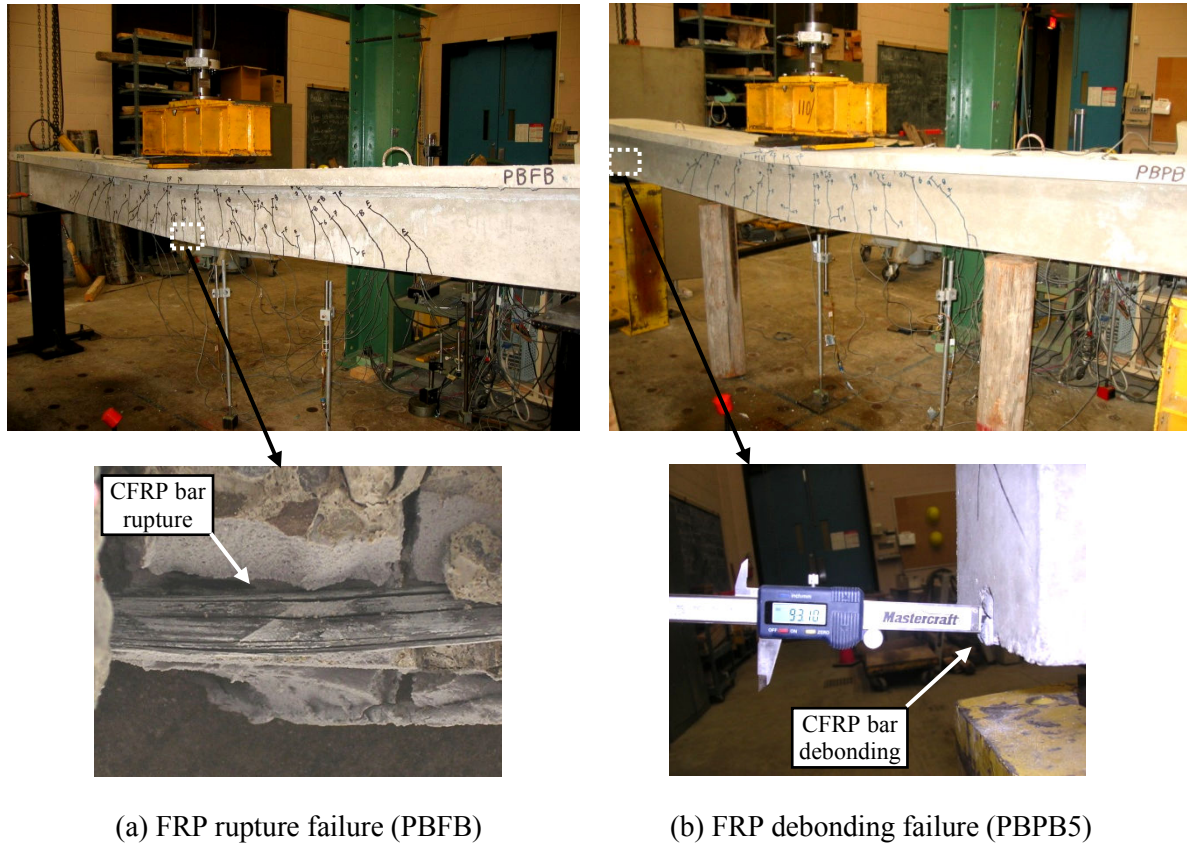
Failure modes of prestressed FRP strengthened beams (Group III)
